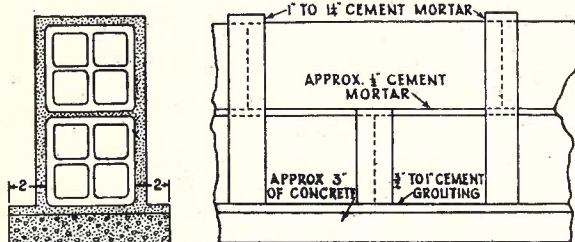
Laying Butt Jointed Conduits in Two Layers.
